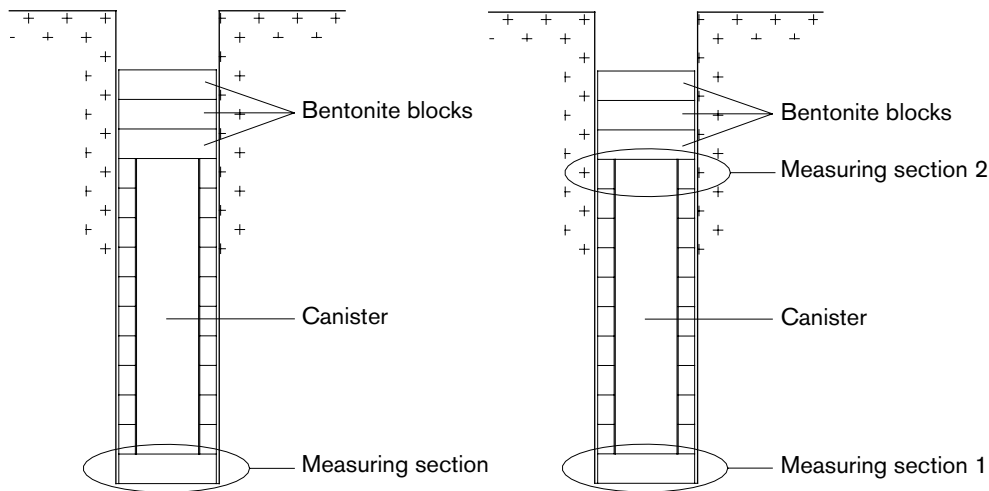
Location of measuring sections for Hole 3 (left) and Hole 6 (right).
